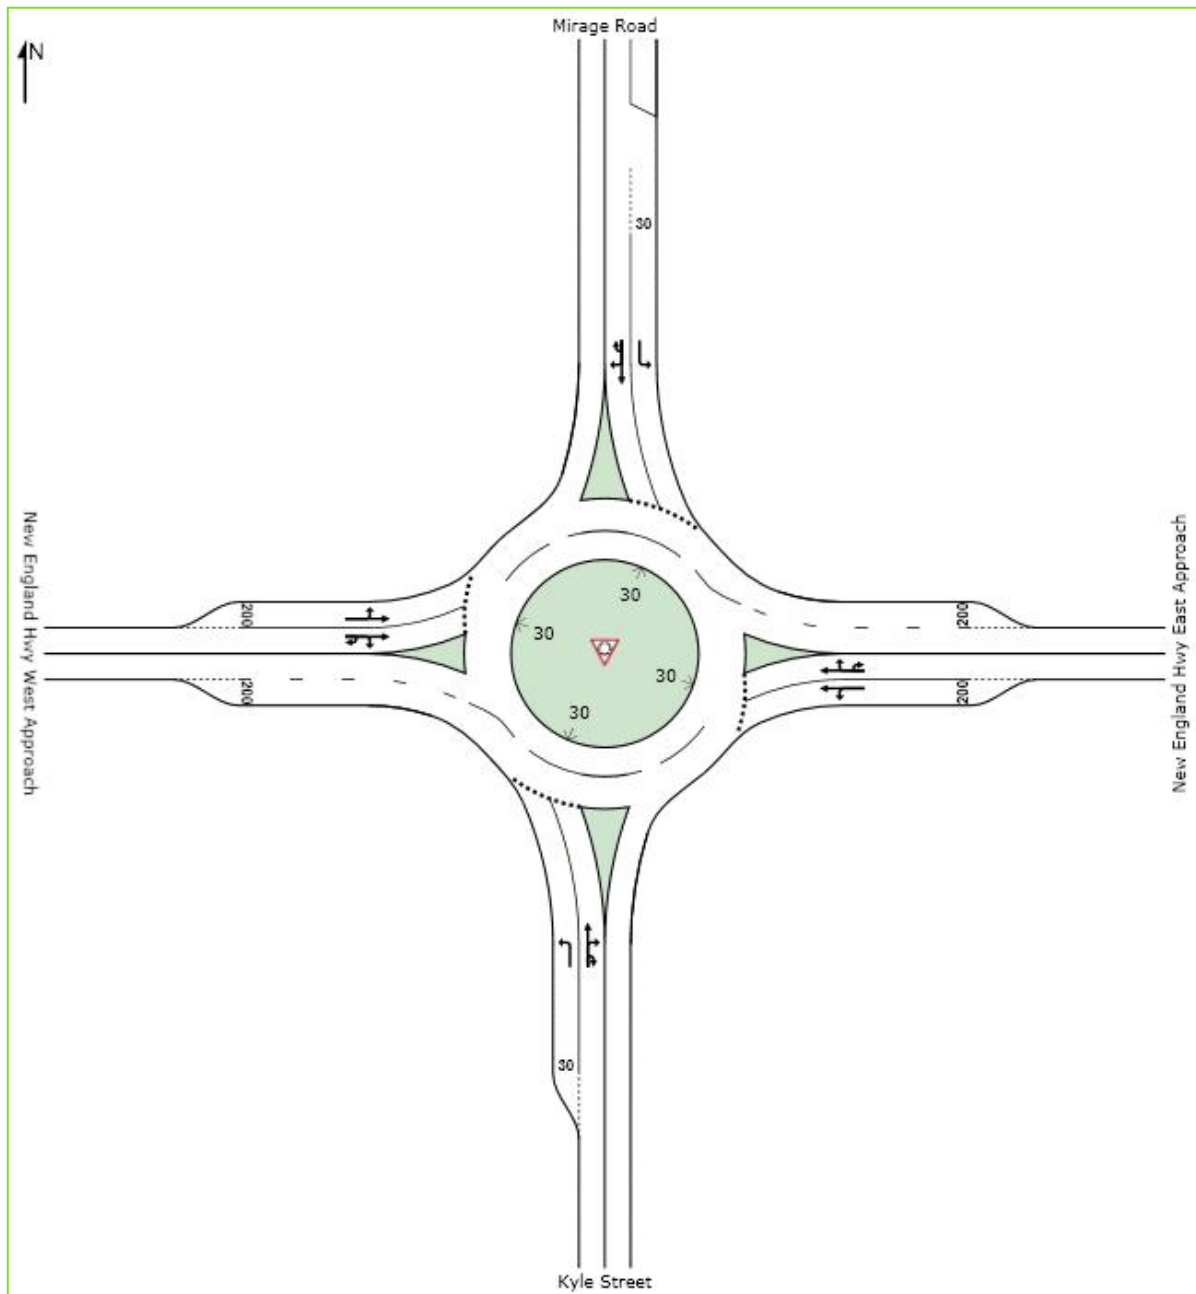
Existing layout of New England Highway / Kyle Street intersection
